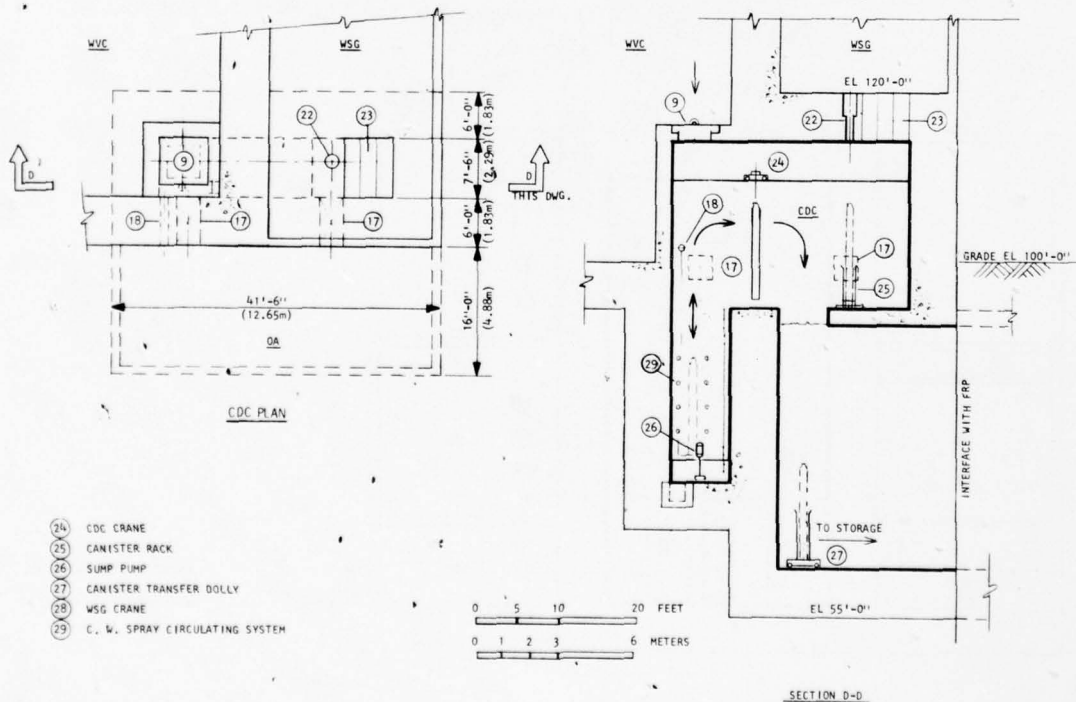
Waste Vitrification Process Equipment Arrangement, CDC Plan and Section D-D
